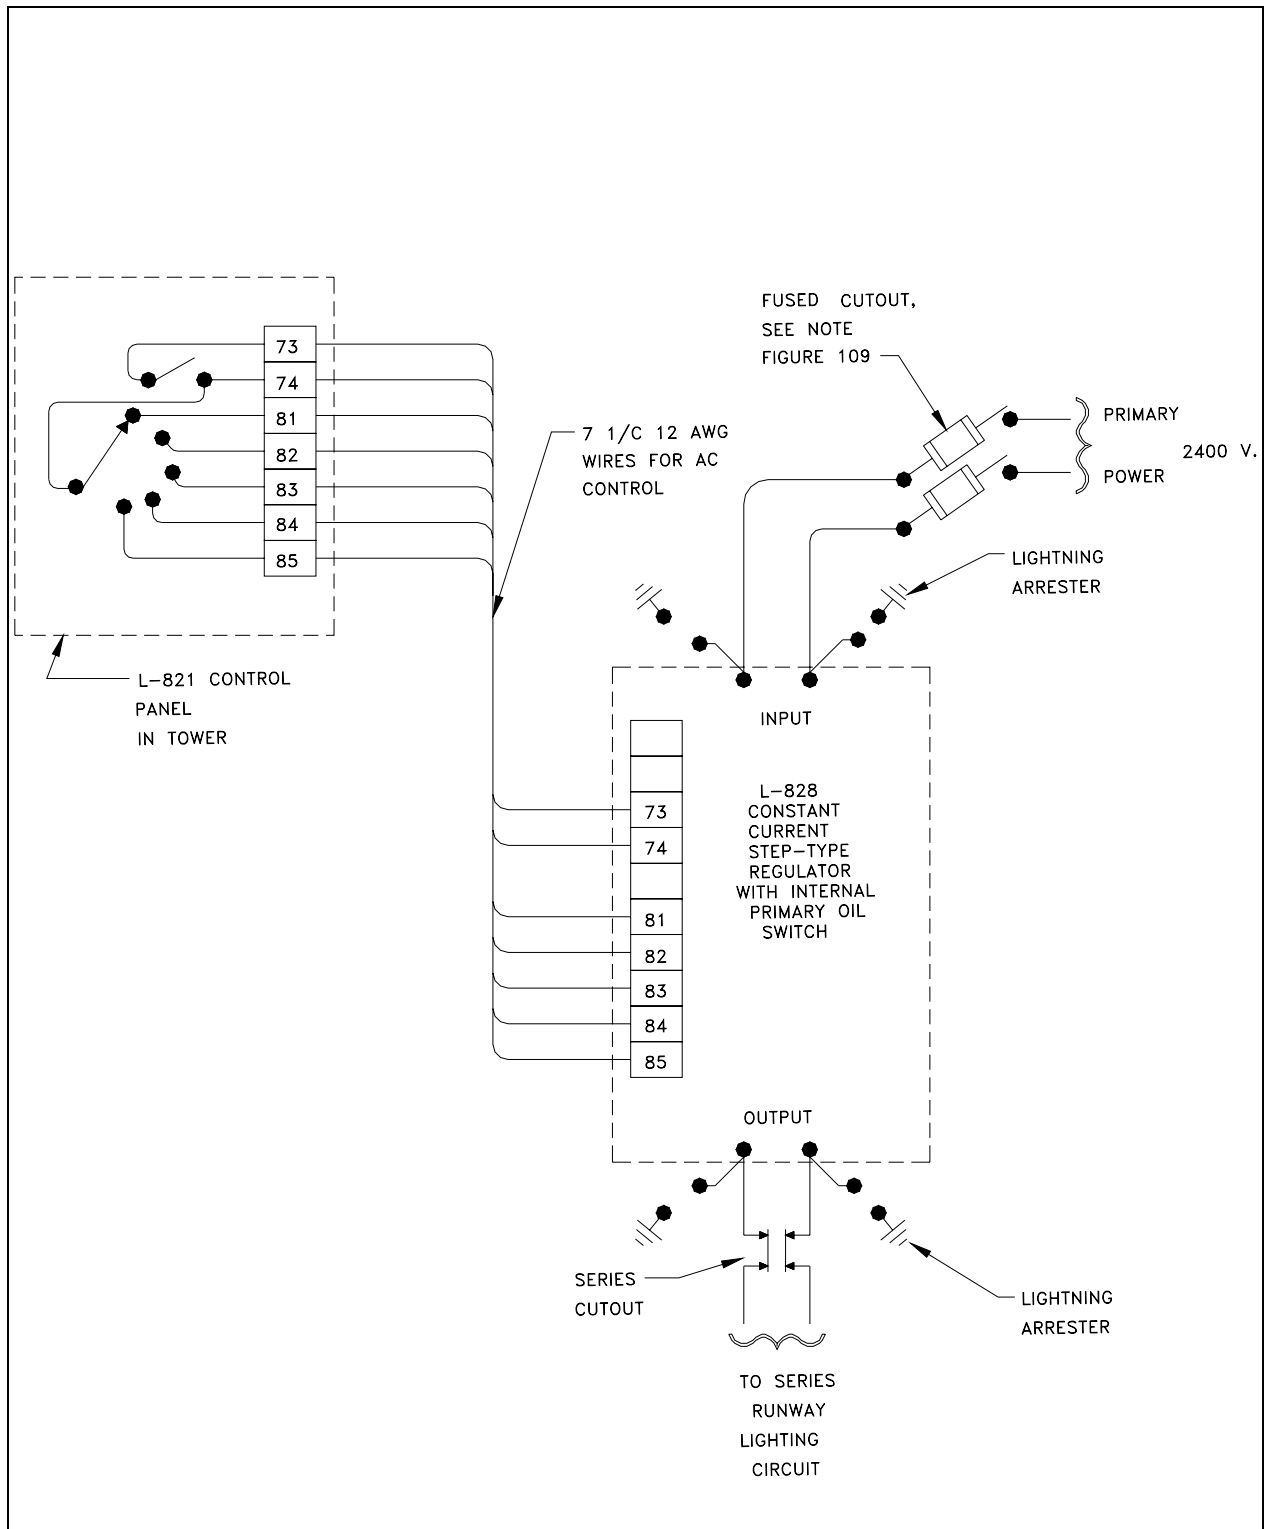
Typical Wiring Diagram Utilizing L-828 Step-type Regulator with Internal Control Power and Primary Oil Switch
